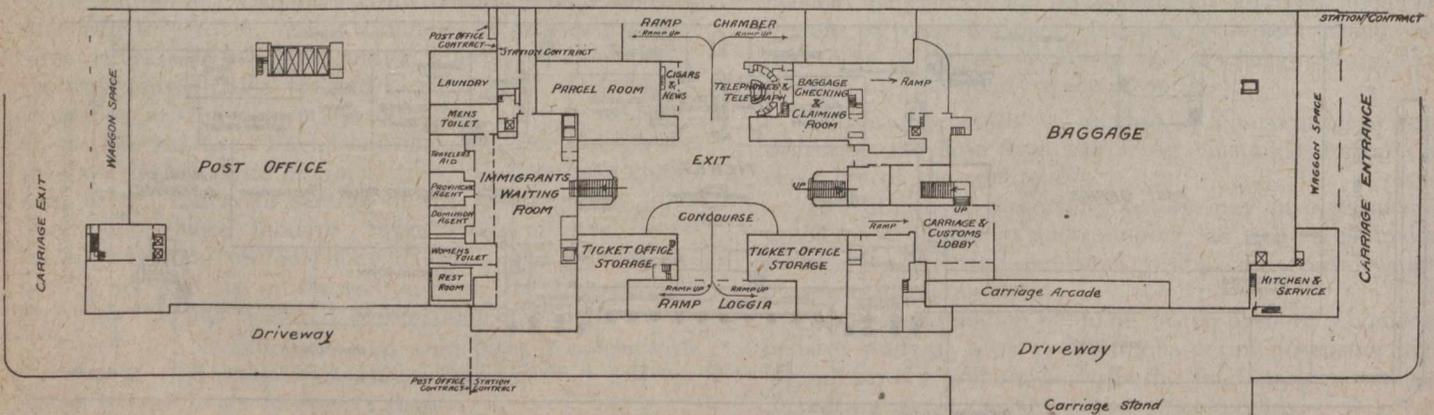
Plan of Lower Level, New Union Station, Toronto
